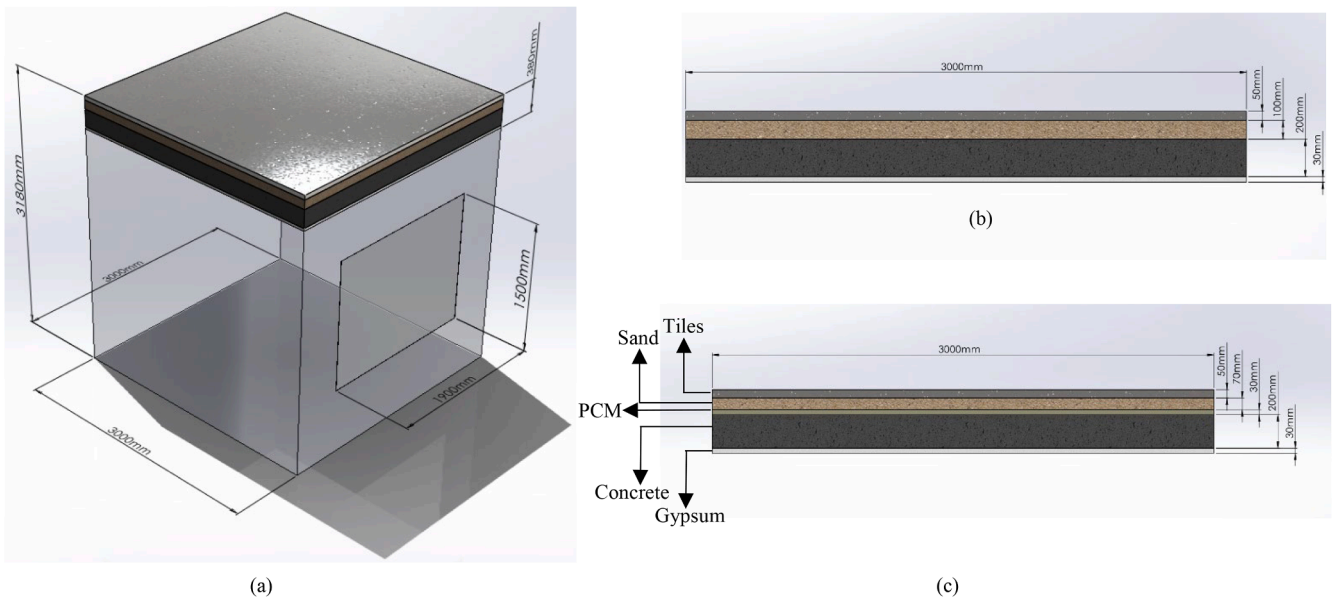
Room Roof Layers Configuration: (a) Basic room with no type of insulation (b) Roof layers (c) Roof layers with PCM layer(c) Roof layers with PCM layer.
